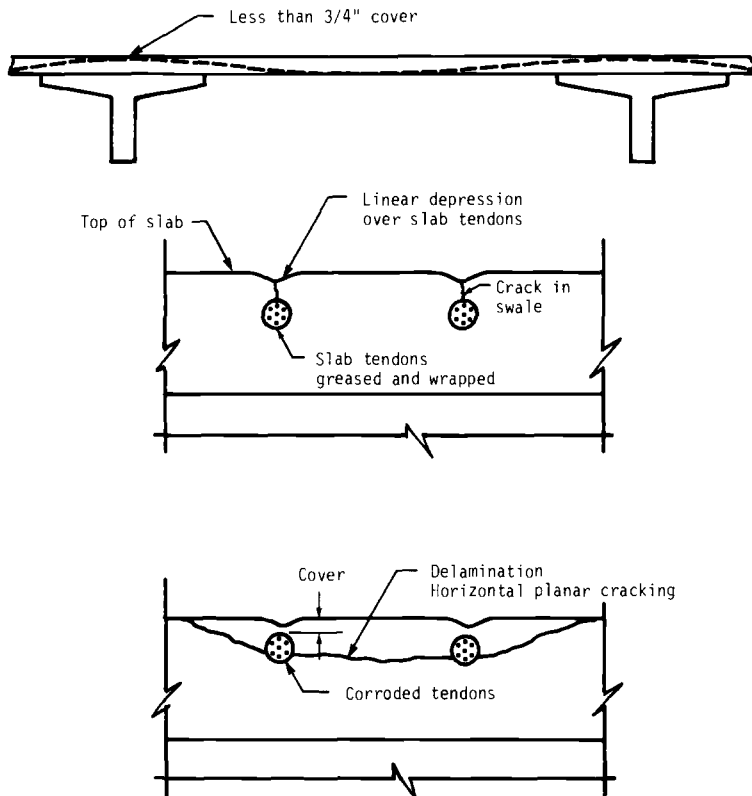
Cracking pattern resulting from corrosion of post-tensioning strands in slab from parking garage [70].
